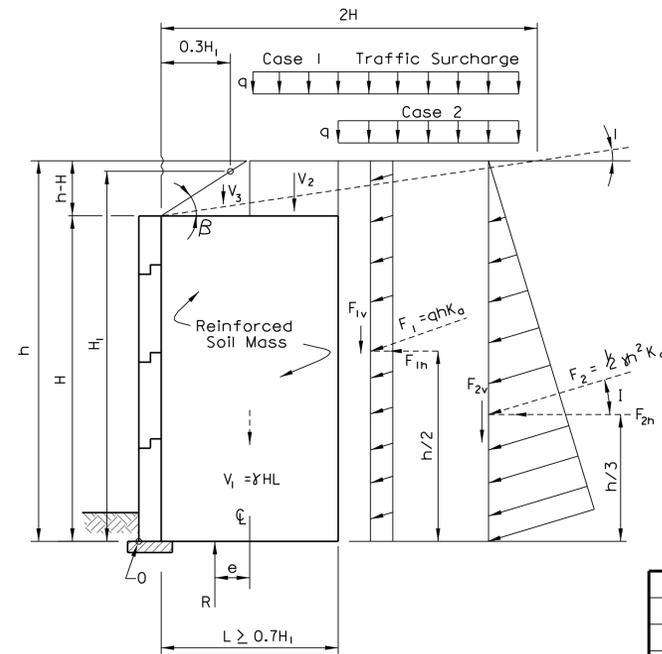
Broken Back Backfill Case (with Traffic Surcharge)
